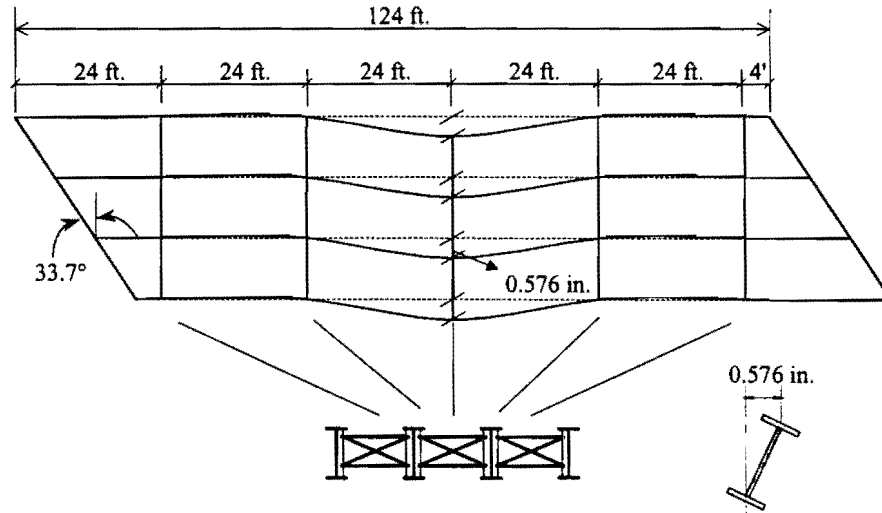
Critical Imperfection Utilized in Four Girder Bridge
